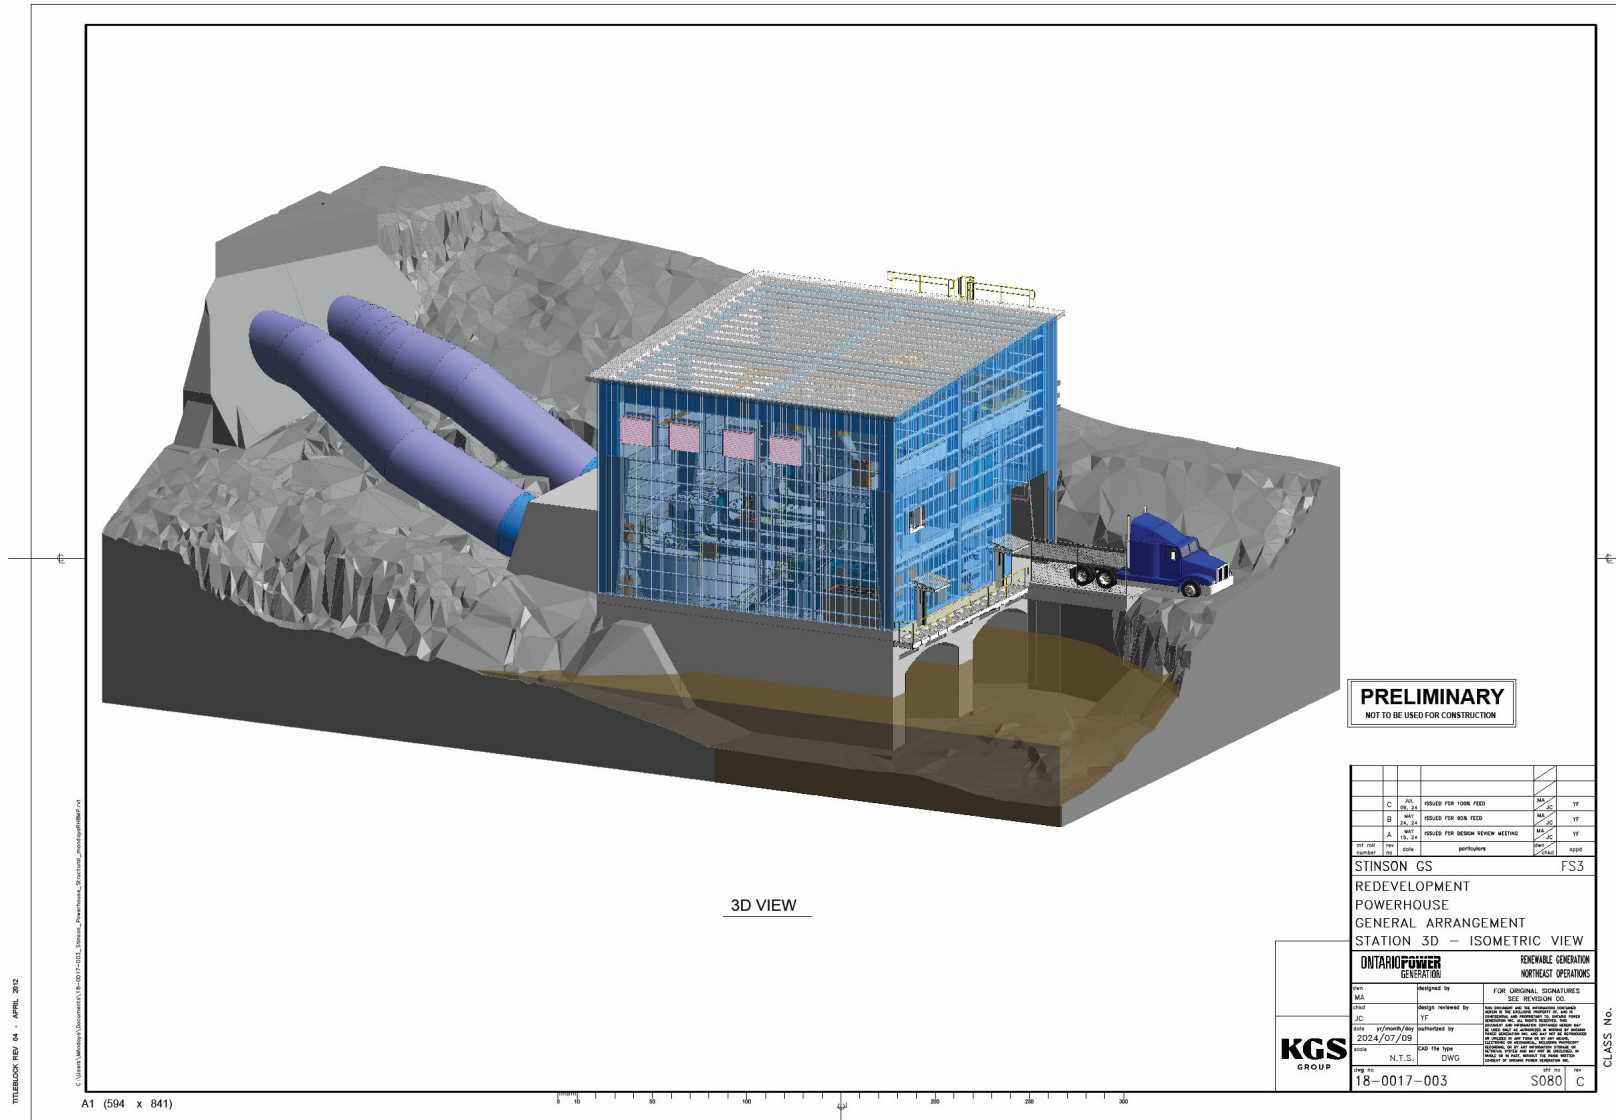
Powerhouse General Arrangement Exterior 3D View
